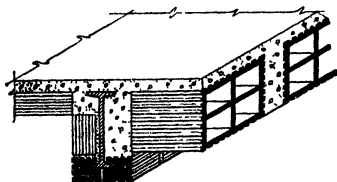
Method of Using Tile Fire-proofing with Long-span Concrete-joist Floor-construction. Note that the covering is put in place before the floor is poured and that the concrete of the joist fills the cells of the tile and bears directly on the flange of the beam.
